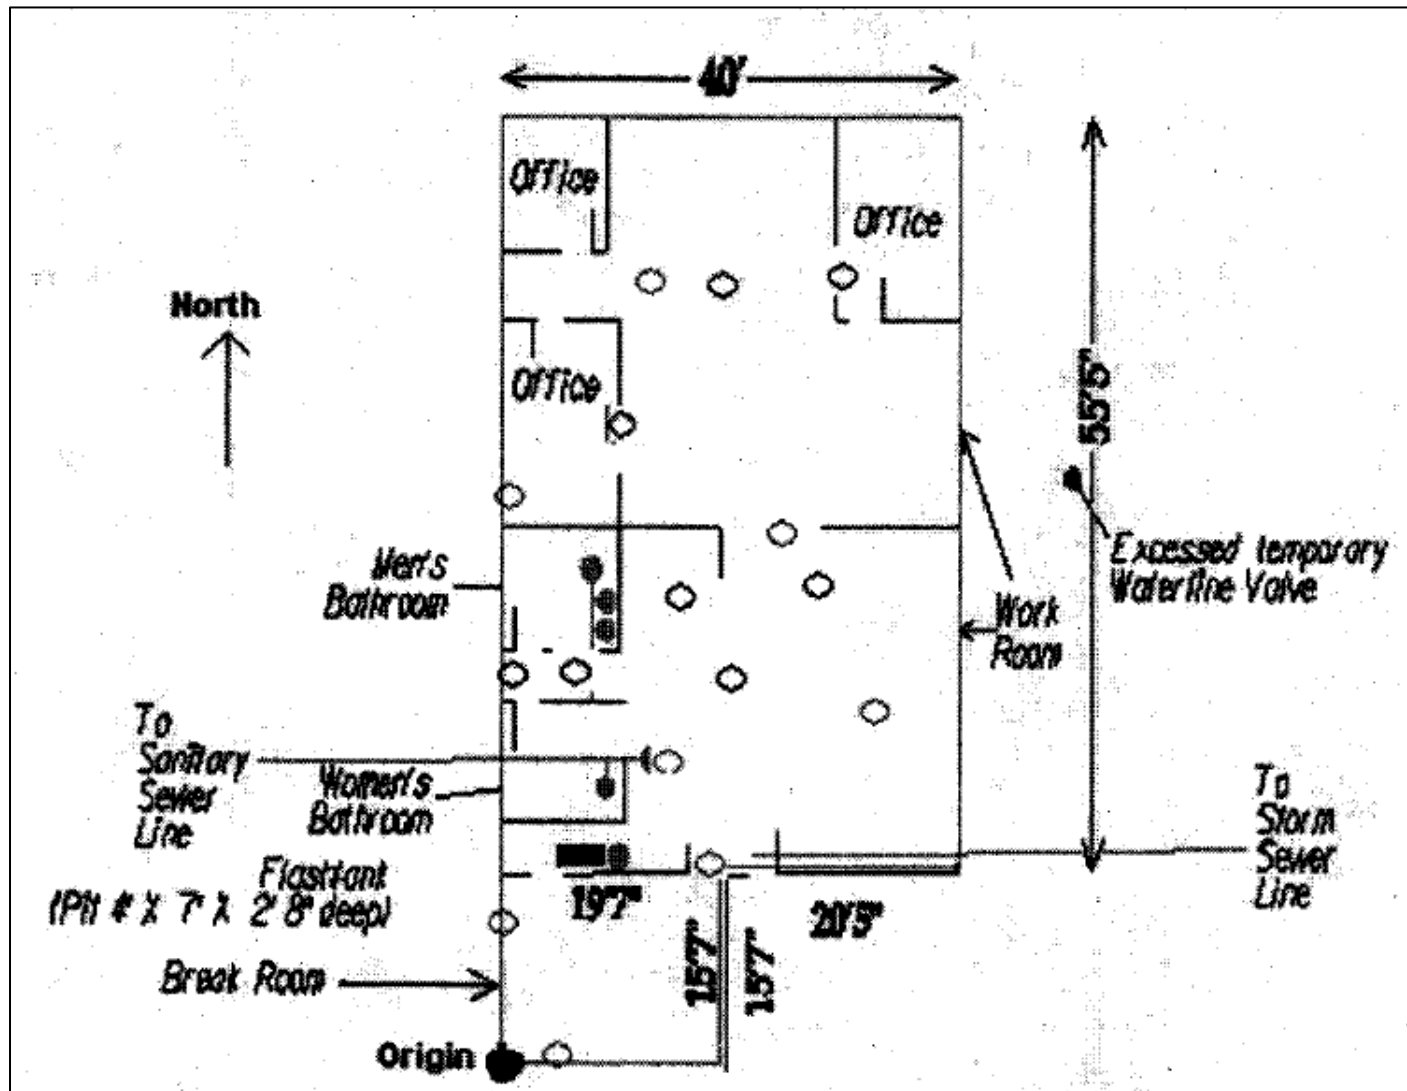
Sample Locations in Zone 2 Exposure Area for Building 725-A (WSRC 2005e)
